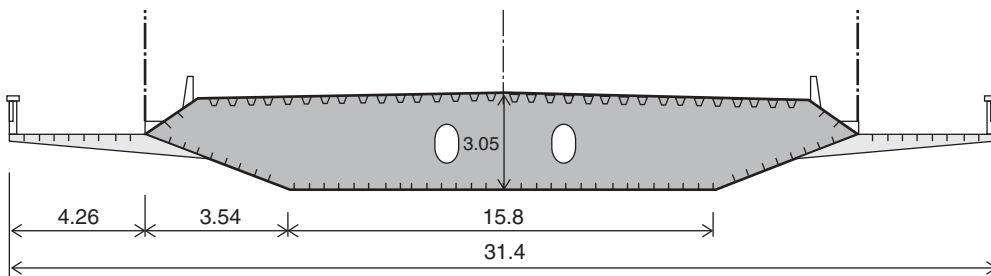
Cross section of the deck in the Yangpu Bridge in Shanghai
